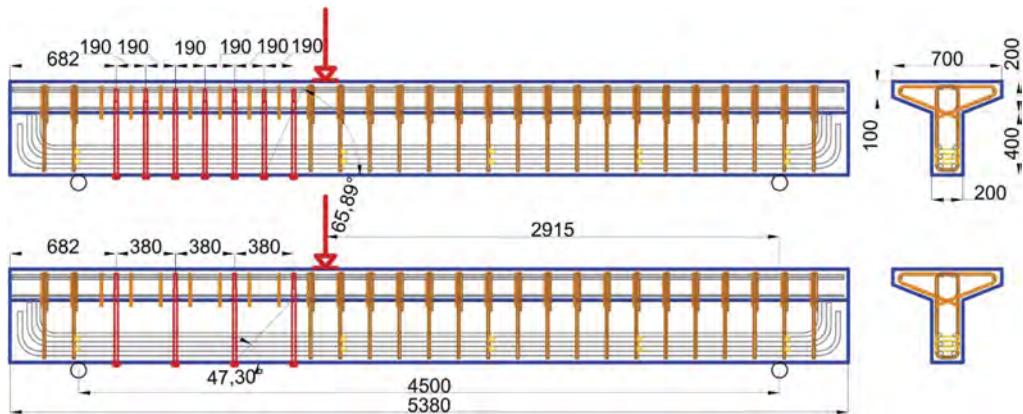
Test setup with reinforcement layout and strengthening variants (units in mm).
